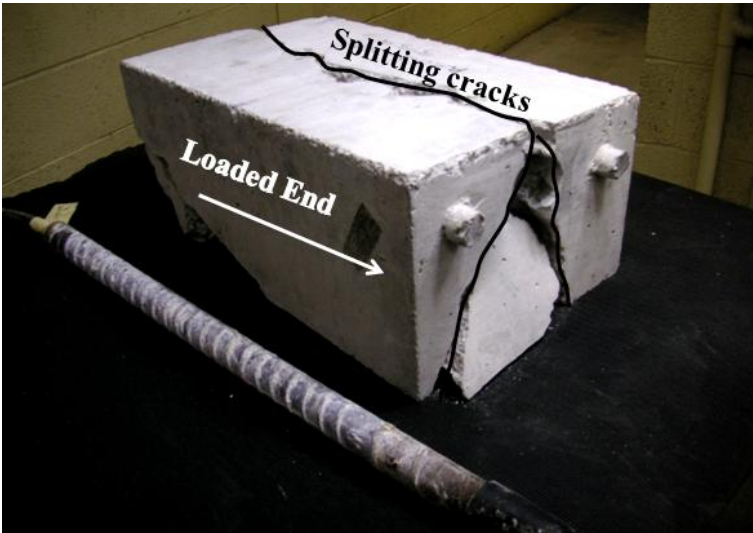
Main anchorage zone and splitting crack pattern of (dissected BE-RAC2-50-375A)
